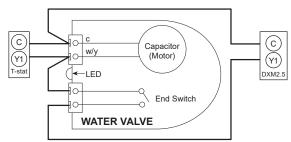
Accessory Motorized Water Valve -Typical Wiring Example #1
